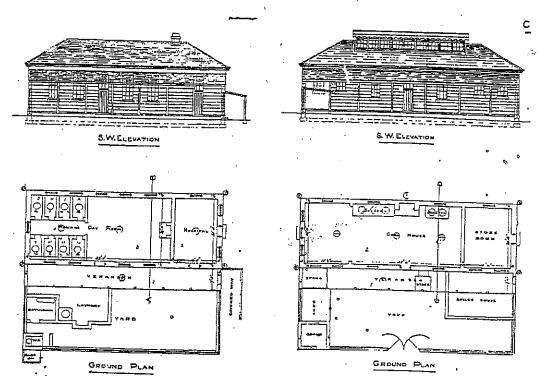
Plan and Elevation of the Female's Wing dated 1925, (DPWS Plan Room No. PC 321/7 - part of)
